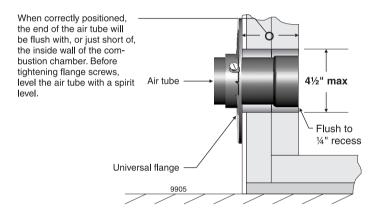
Mark insertion depth on air tube when using universal flange mounting
